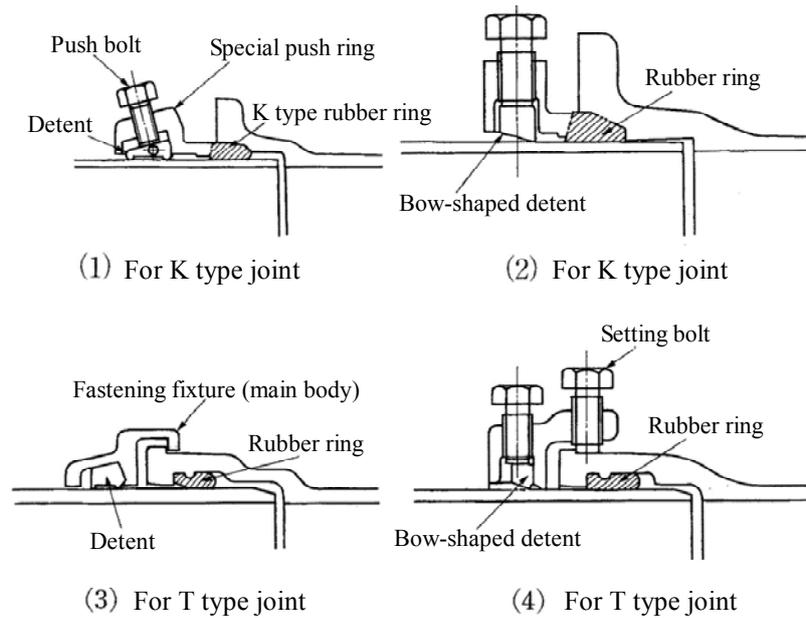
Examples of anti-escapement fixture (for ductile iron pipe)
